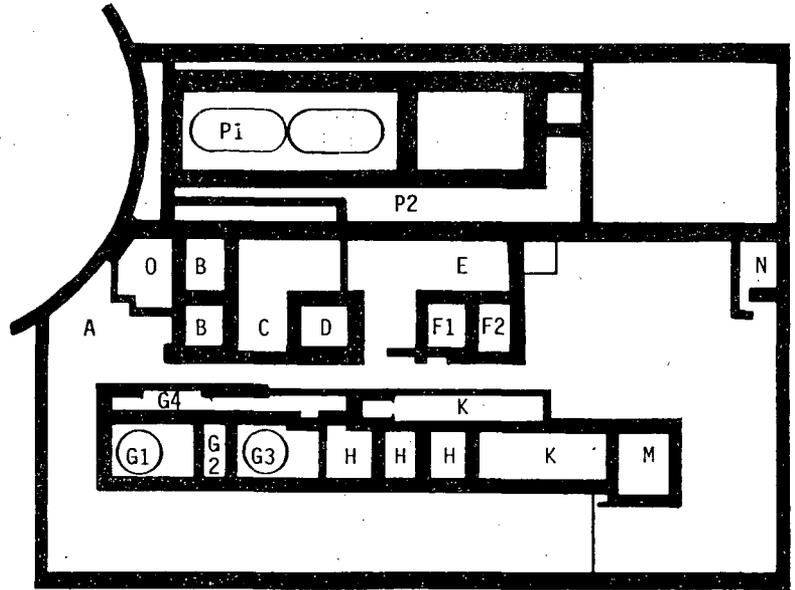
Auxiliary and Fuel Handling Buildings, 305-Foot Elevation.
